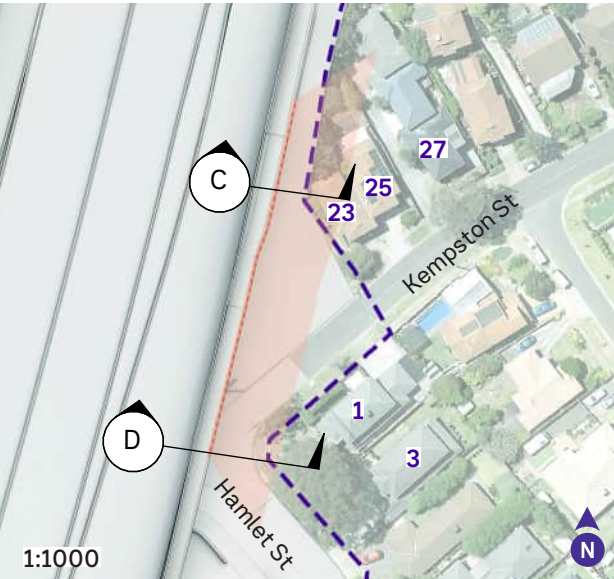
Focus Analysis: Kempston Street Shared Use Path Bridge - Overlooking Analysis Plan - throw screen Type A or B application (no overlooking mitigation)
